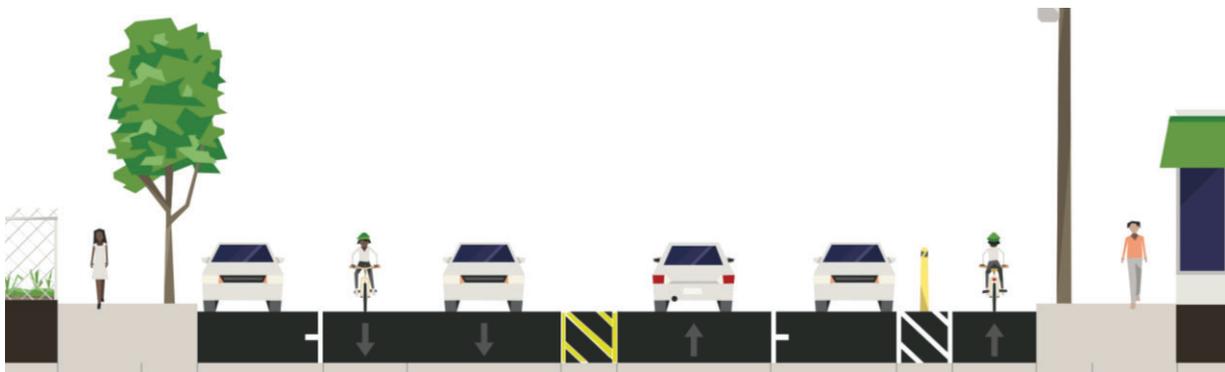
Proposed Cross Section of Evans Avenue between Napoleon and Rankin streets, looking west
